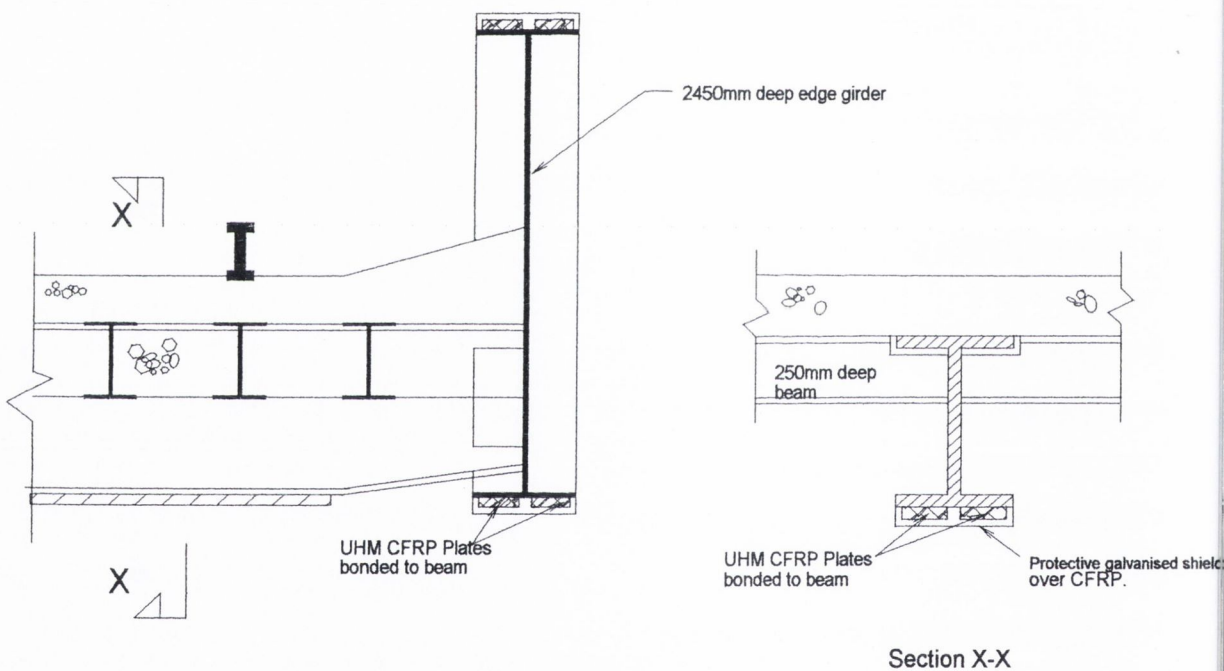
The UHM CFRP plates bonded to the bridge beams with the protective galvanised plates in place (Dodds 2003).
